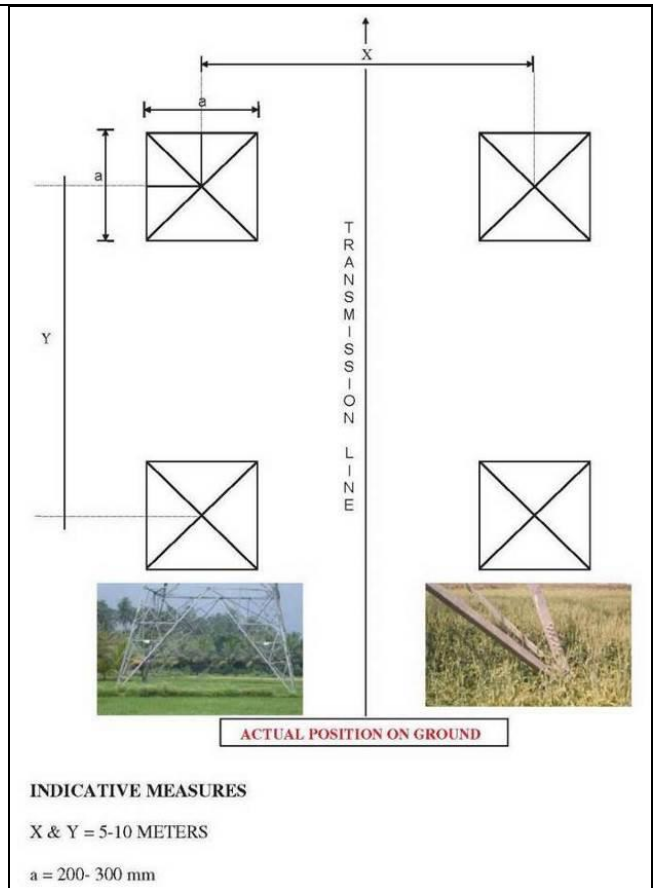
Typical Plan of Transmission Line Tower Footing Showing actual Ground Position and Extent of Impact
